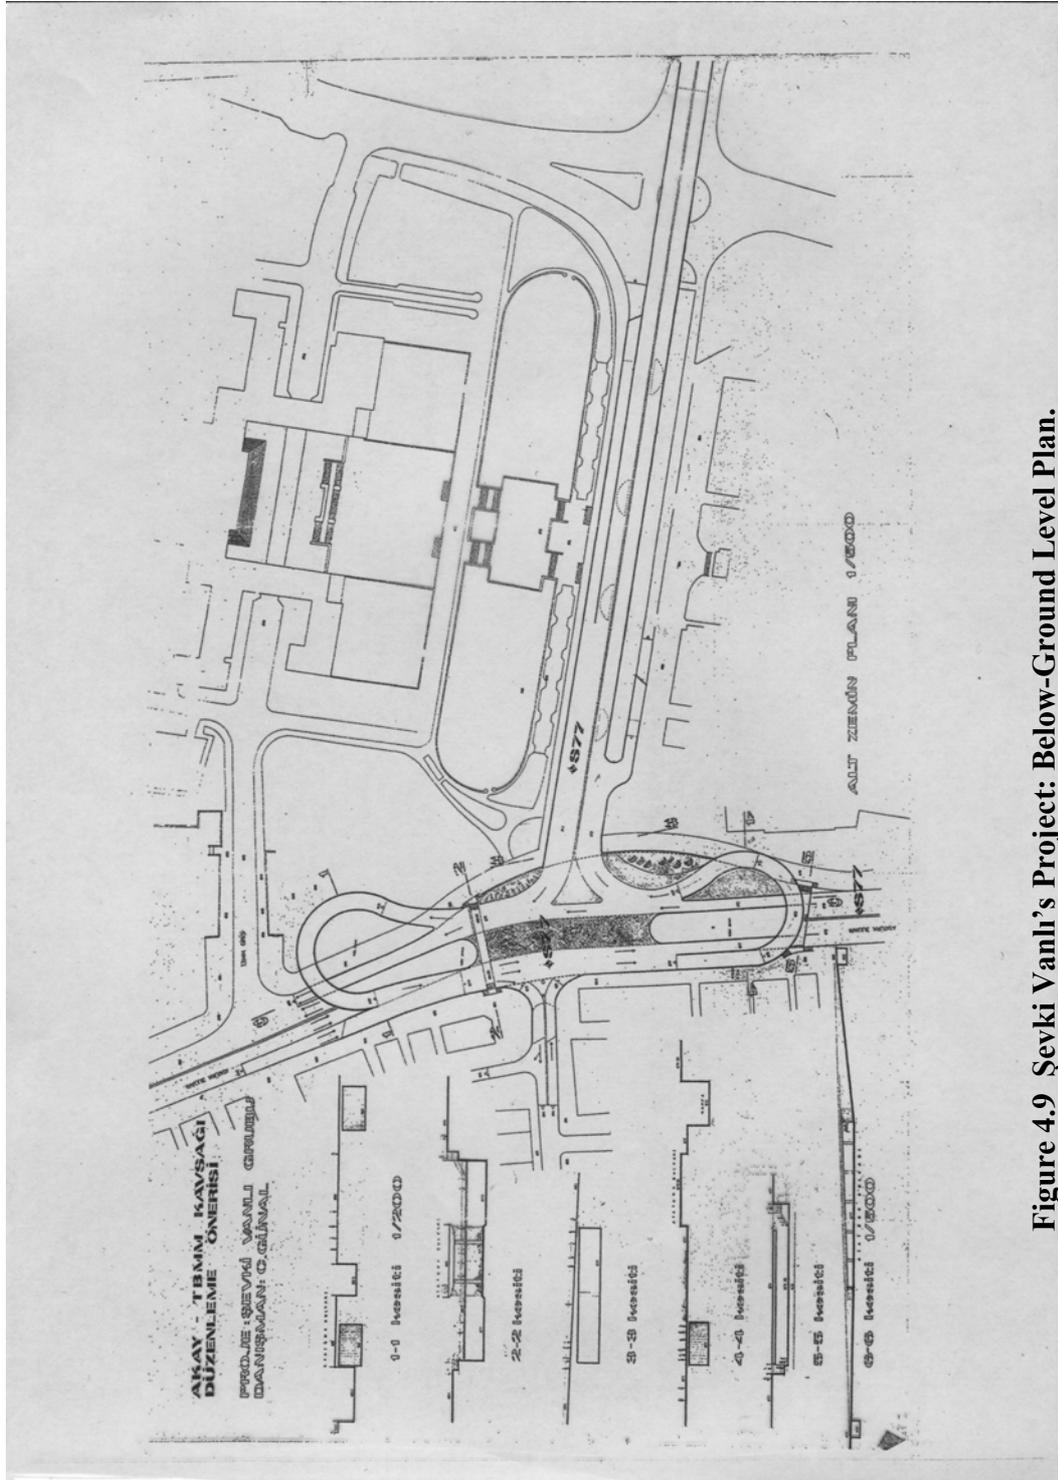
Şevki Vanlı's Project: Below-Ground Level Plan.
